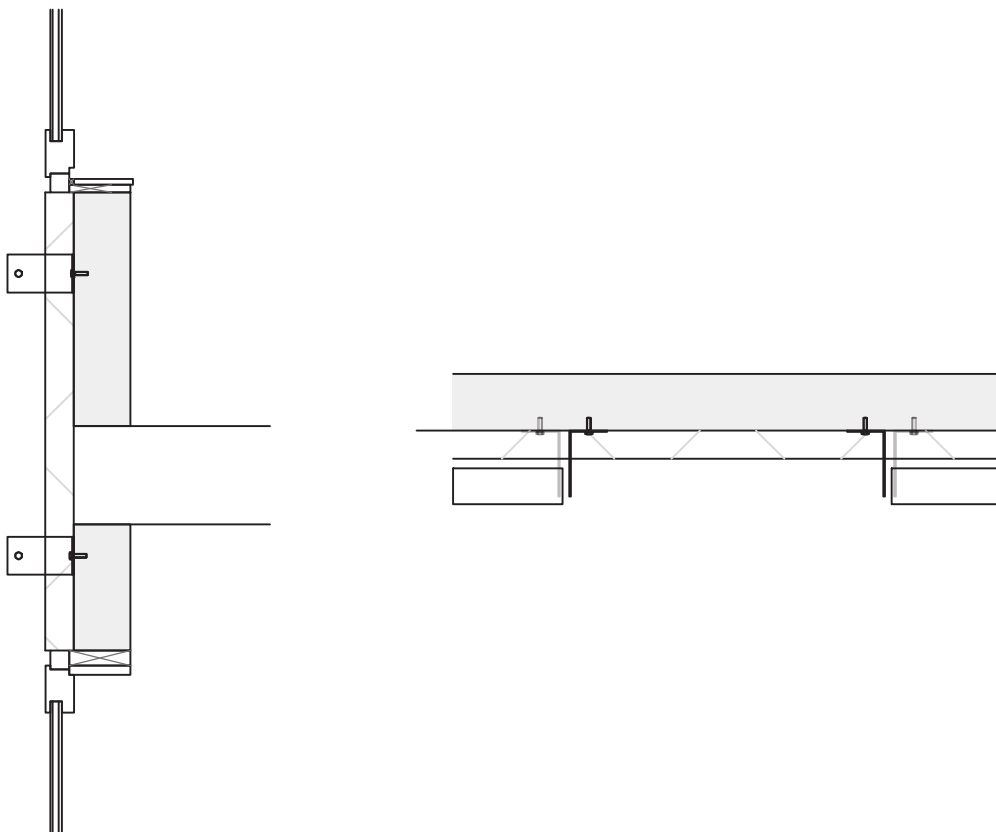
| 1:20 Section and top view of when the *existing facade panel* is removed. | Source: Own work
